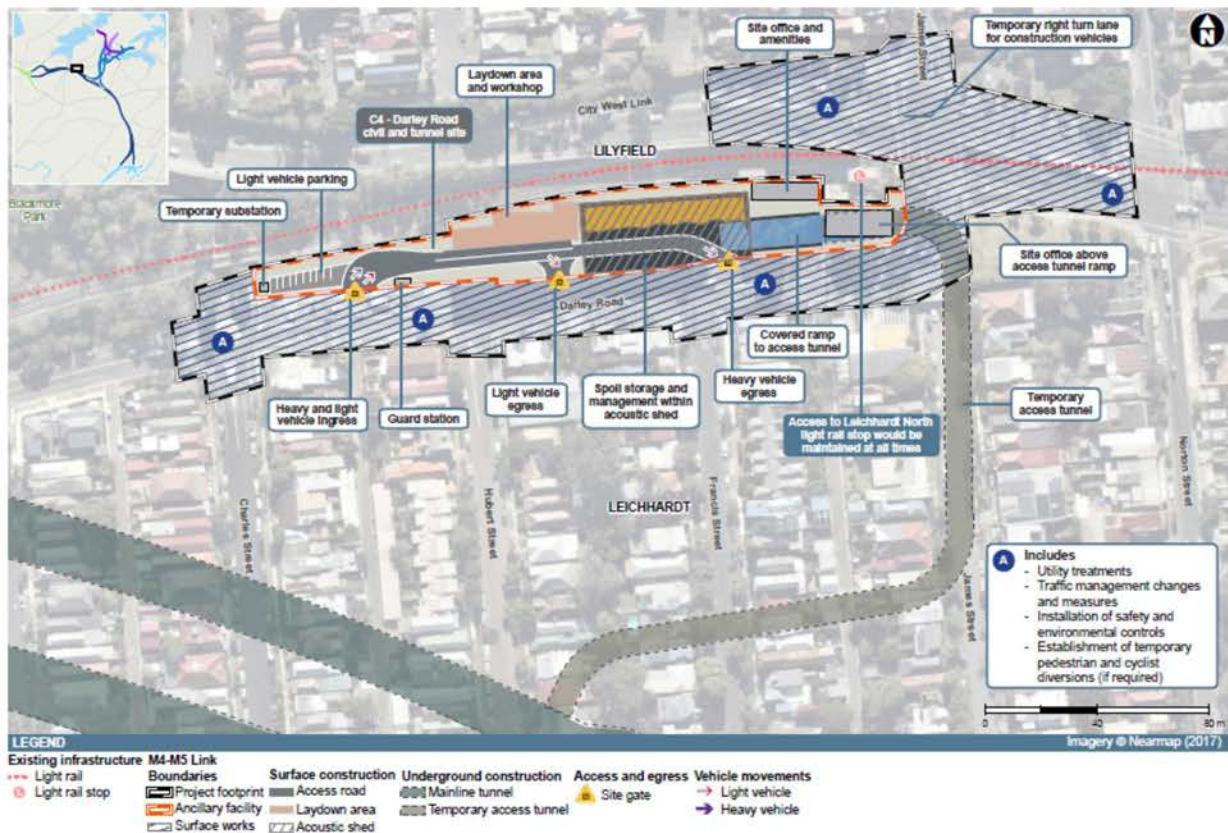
Indicative Darley Road civil and tunnel site (C4) layout
